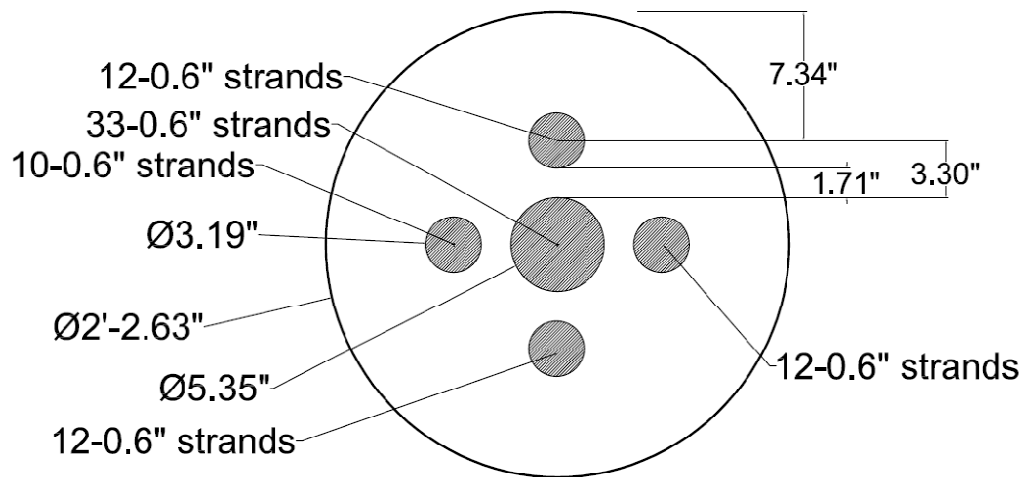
A Typical Column Cross Section/Tendon Layout at the Base of the UHPC Lattice Tower
